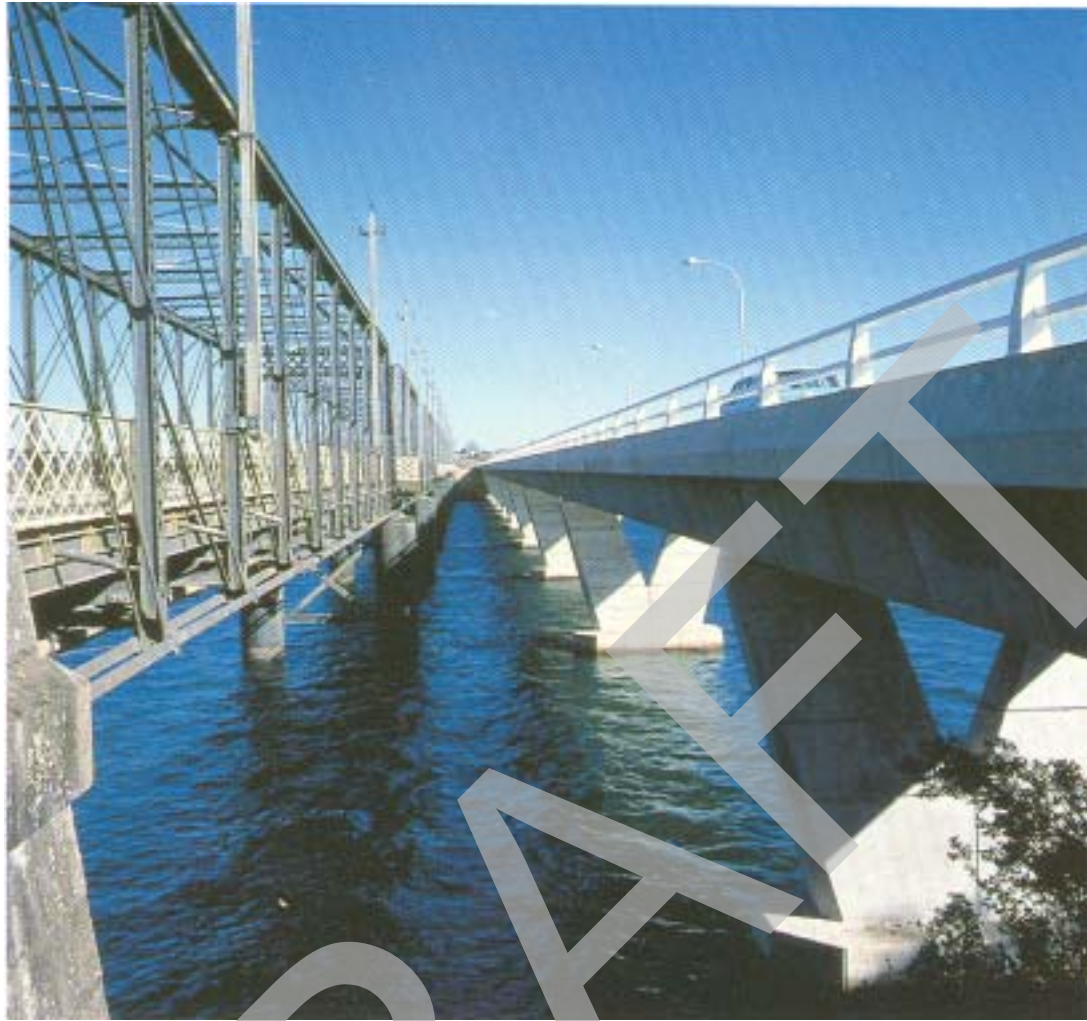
Nowra Bridge over the Shoalhaven River. Built 1880, and duplicated in 1981.
